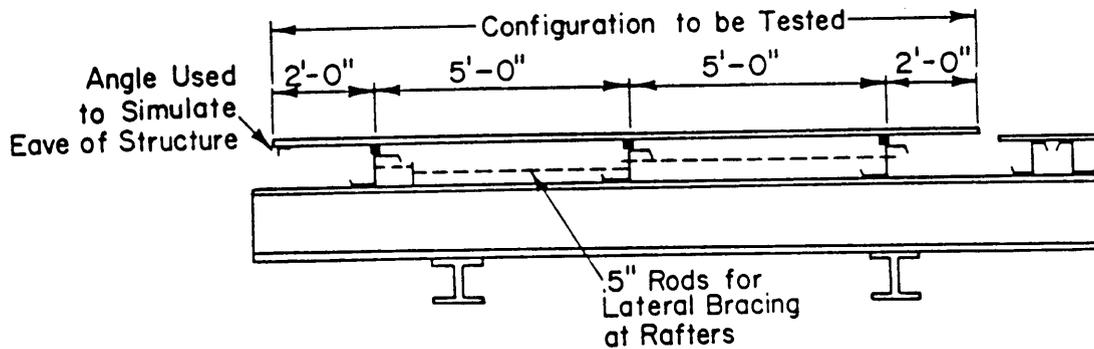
Cross-Section of Three Span Continuous Test Setup
